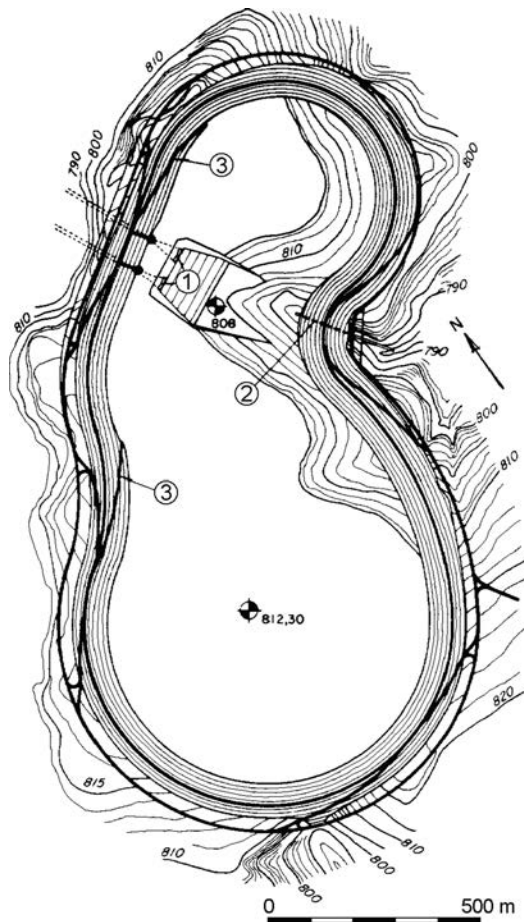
Plan of the upper reservoir (*La Muela*) (Navalon & Gaztanaga, 1988). (1) Intake structure; (2) bottom outlet; (3) access road.
